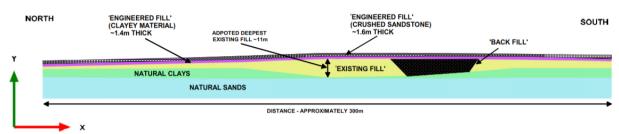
Long Section of Site with Proposed 'Engineered Fill' Blanket (J&K, 2016a)
